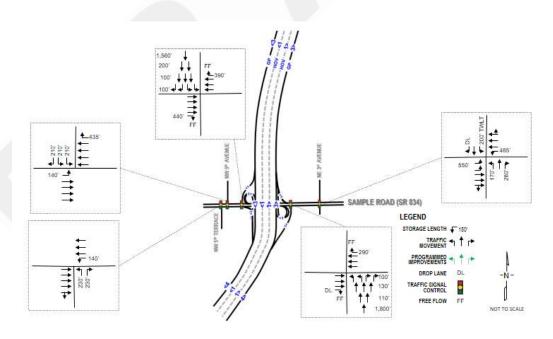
Existing Roadway and Intersection Lane Configurations
